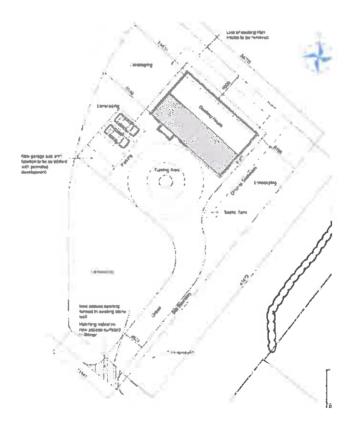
Parking on front of plot at Greenwood, south of Beechwood (constructed)
